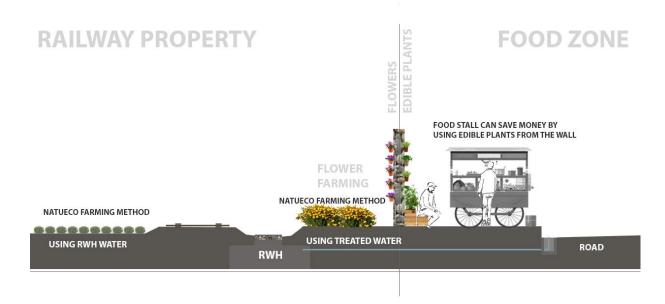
Design strategy for boundary wall aligned to commercial street. Source: Krutika Patel
